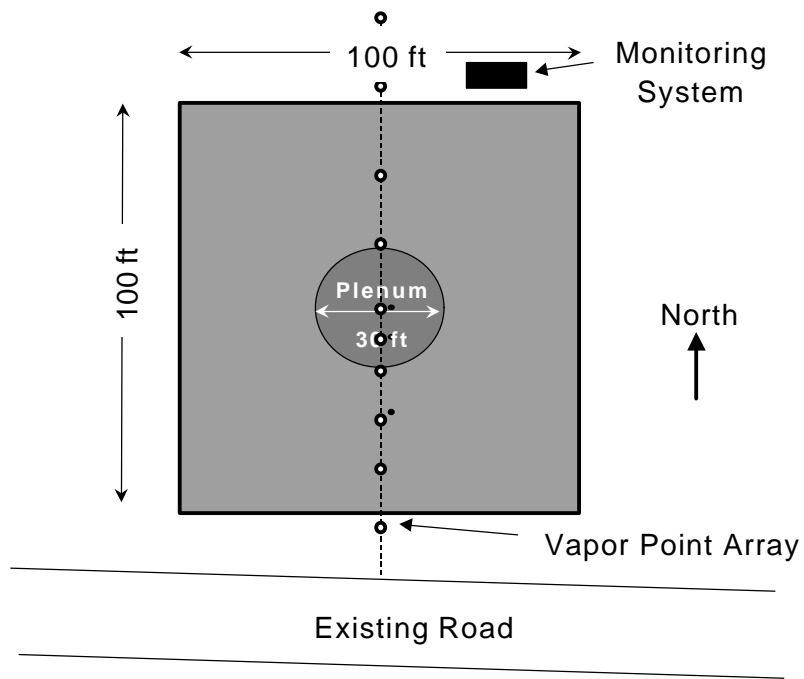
Plan view of BERT™ installation at the RWMC over Pit 2.
